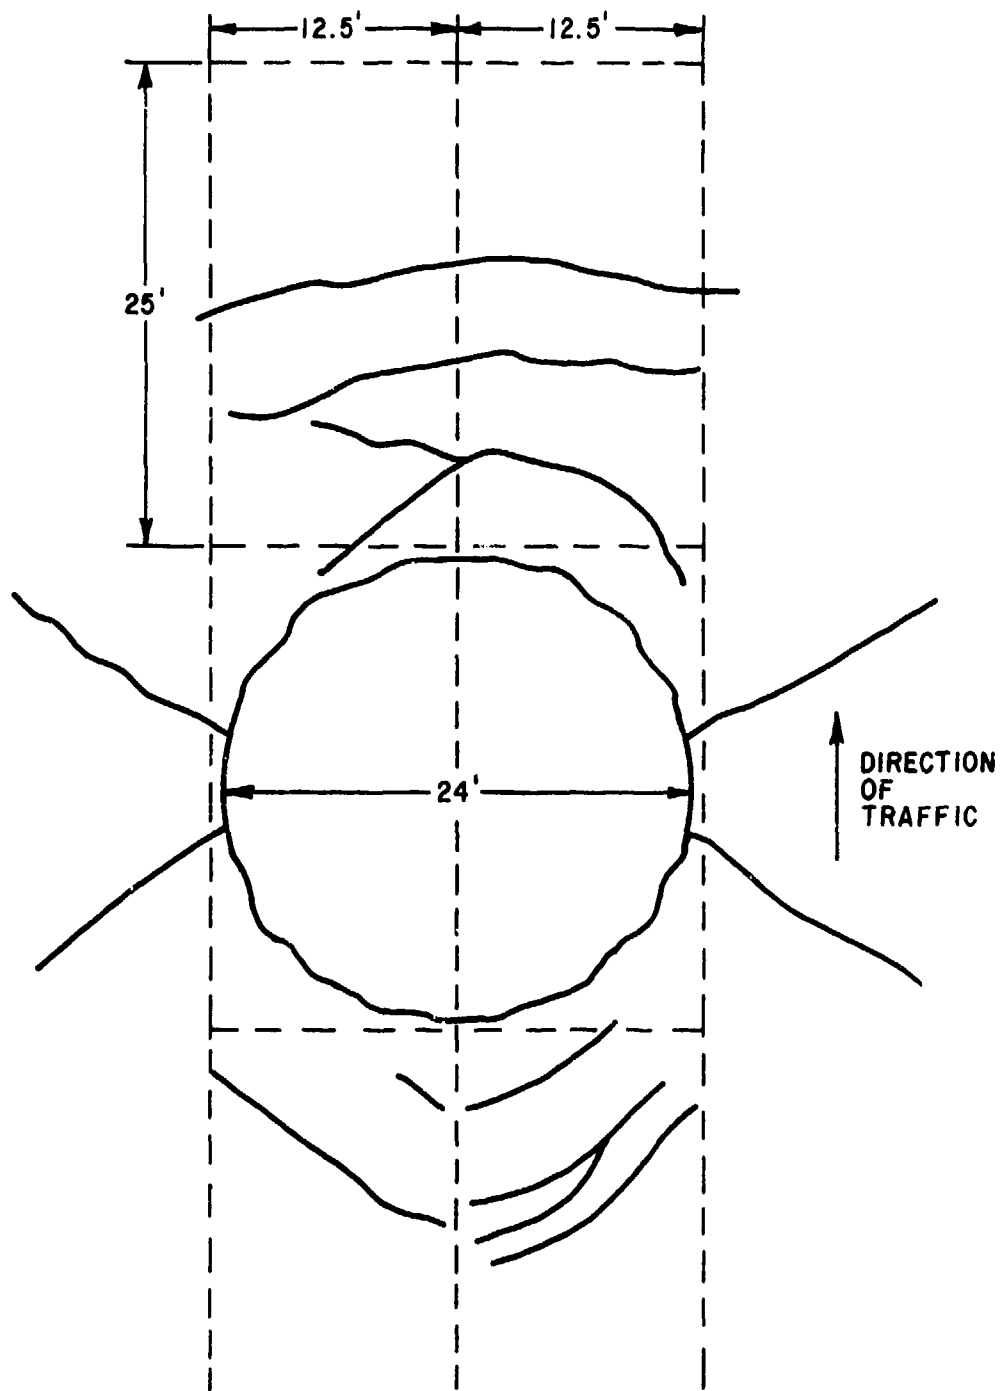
Cracking Pattern in Runway Slabs Surrounding Crater 1
